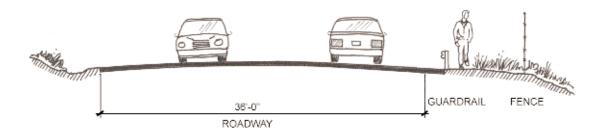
Existing Conditions at Lincoln Boulevard at Crissy Field Avenue
